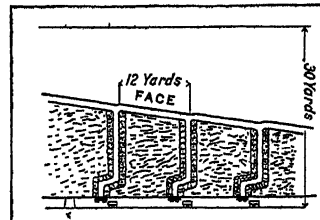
PLAN OF TWO "SIDES OF WORK" WITH GATE ROADS, BOLT HOLES, FIRE RIBS AND PILLARS
